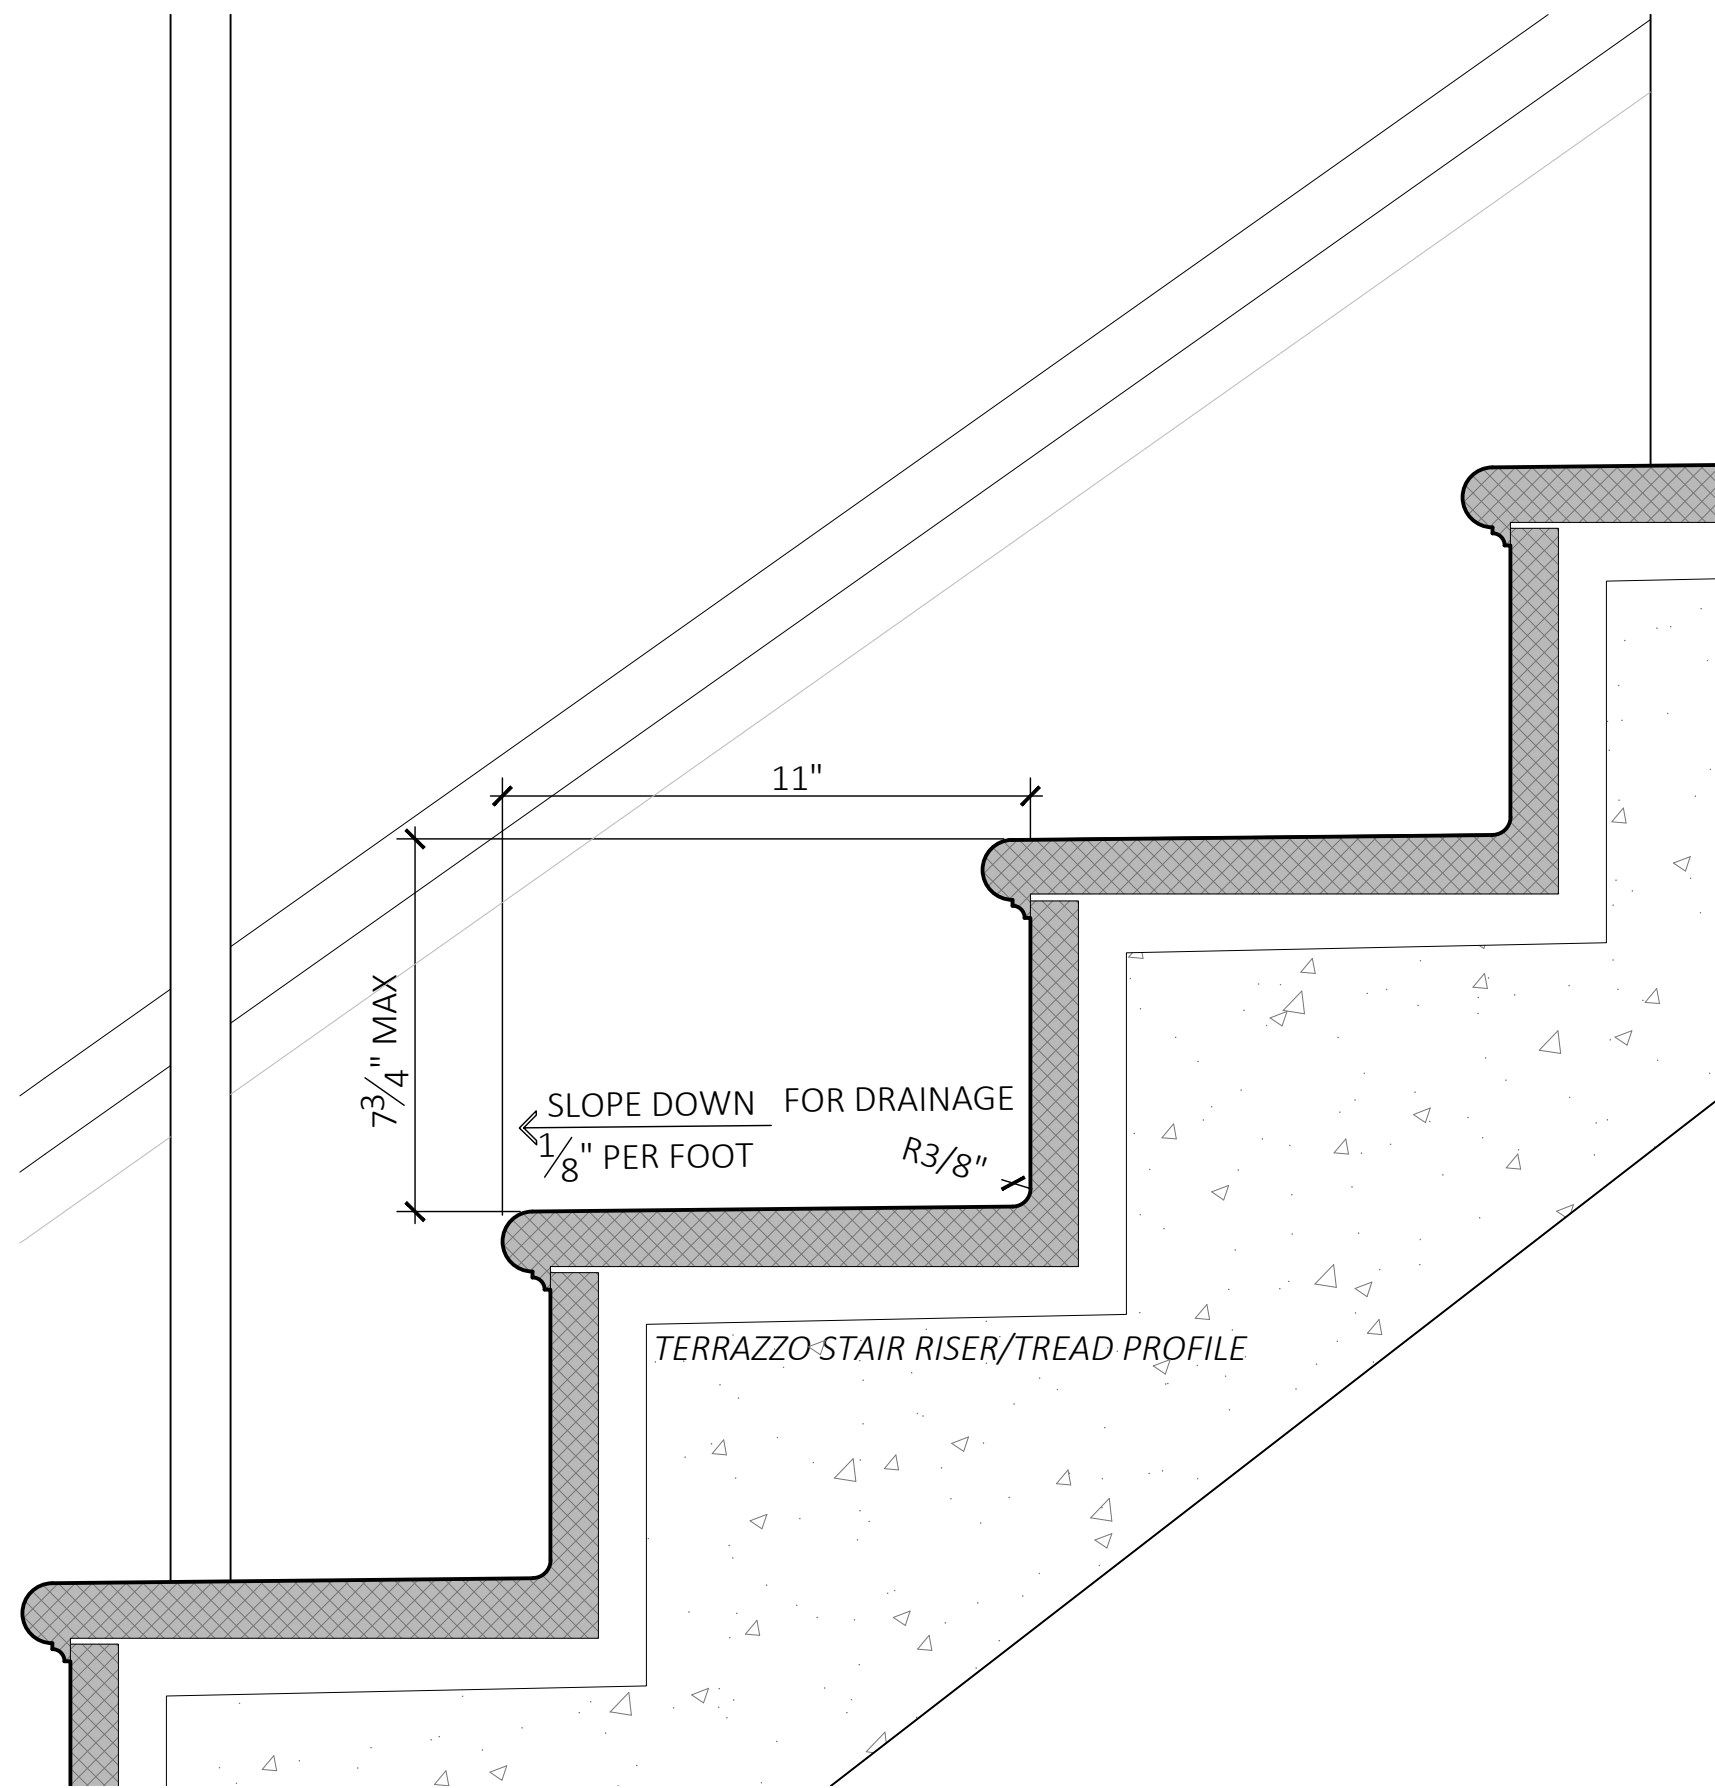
ENTRY LANDING - PROPOSED 3
